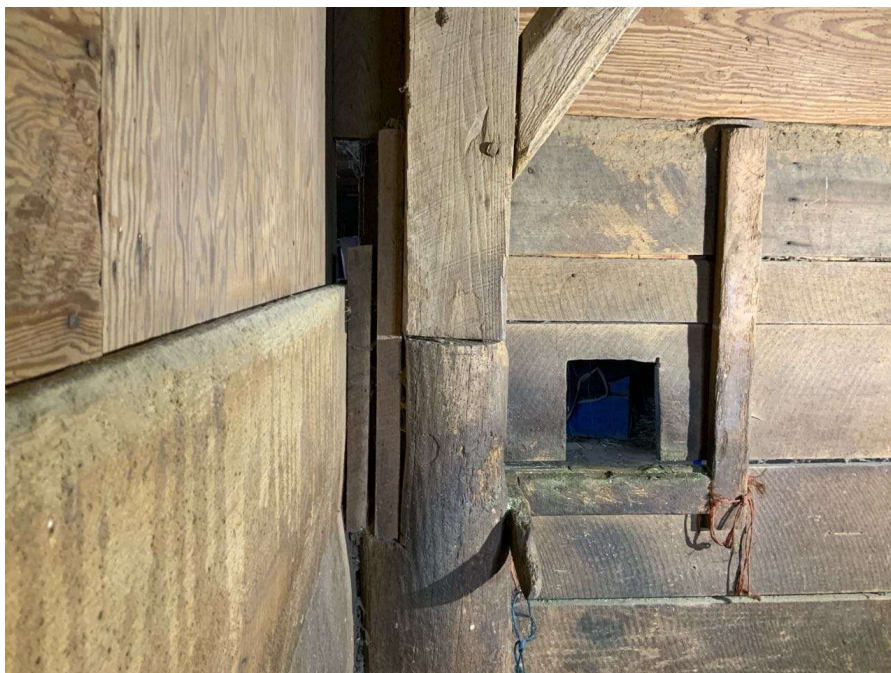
The bottom portion of Column C/2 at grade level consists of a round post spliced to the original column using timber boards.
